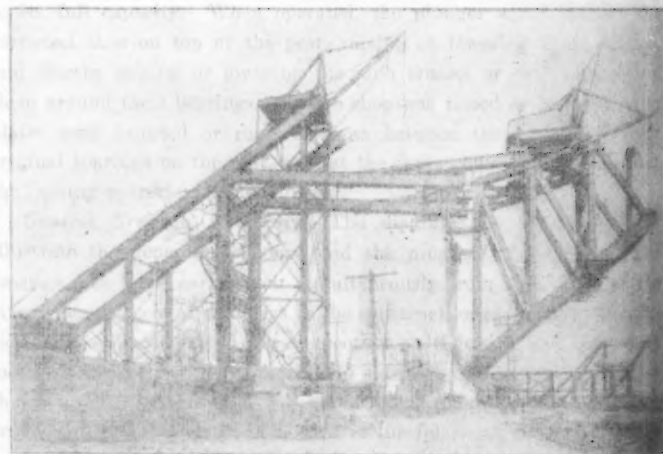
HELL GATE BRIDGE, ERECTION STAGE, APRIL 1915, LONG ISLAND BAY.
